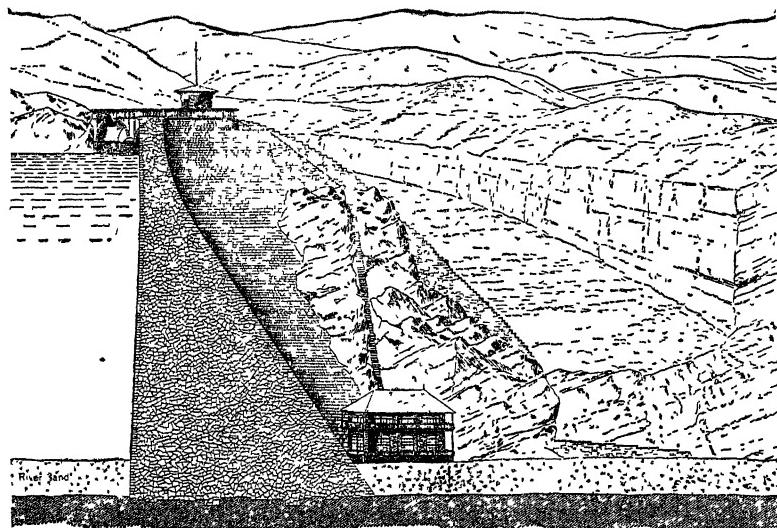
Section of Salt River Dam and Elevation of Spillway and Power House
